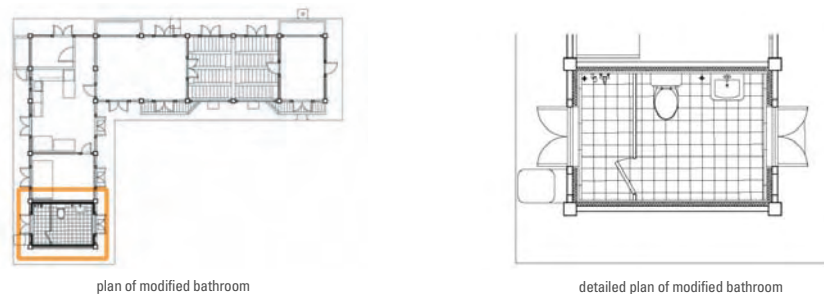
Design Guidelines for Modification of Layout and Structure (renovation of bathroom)
